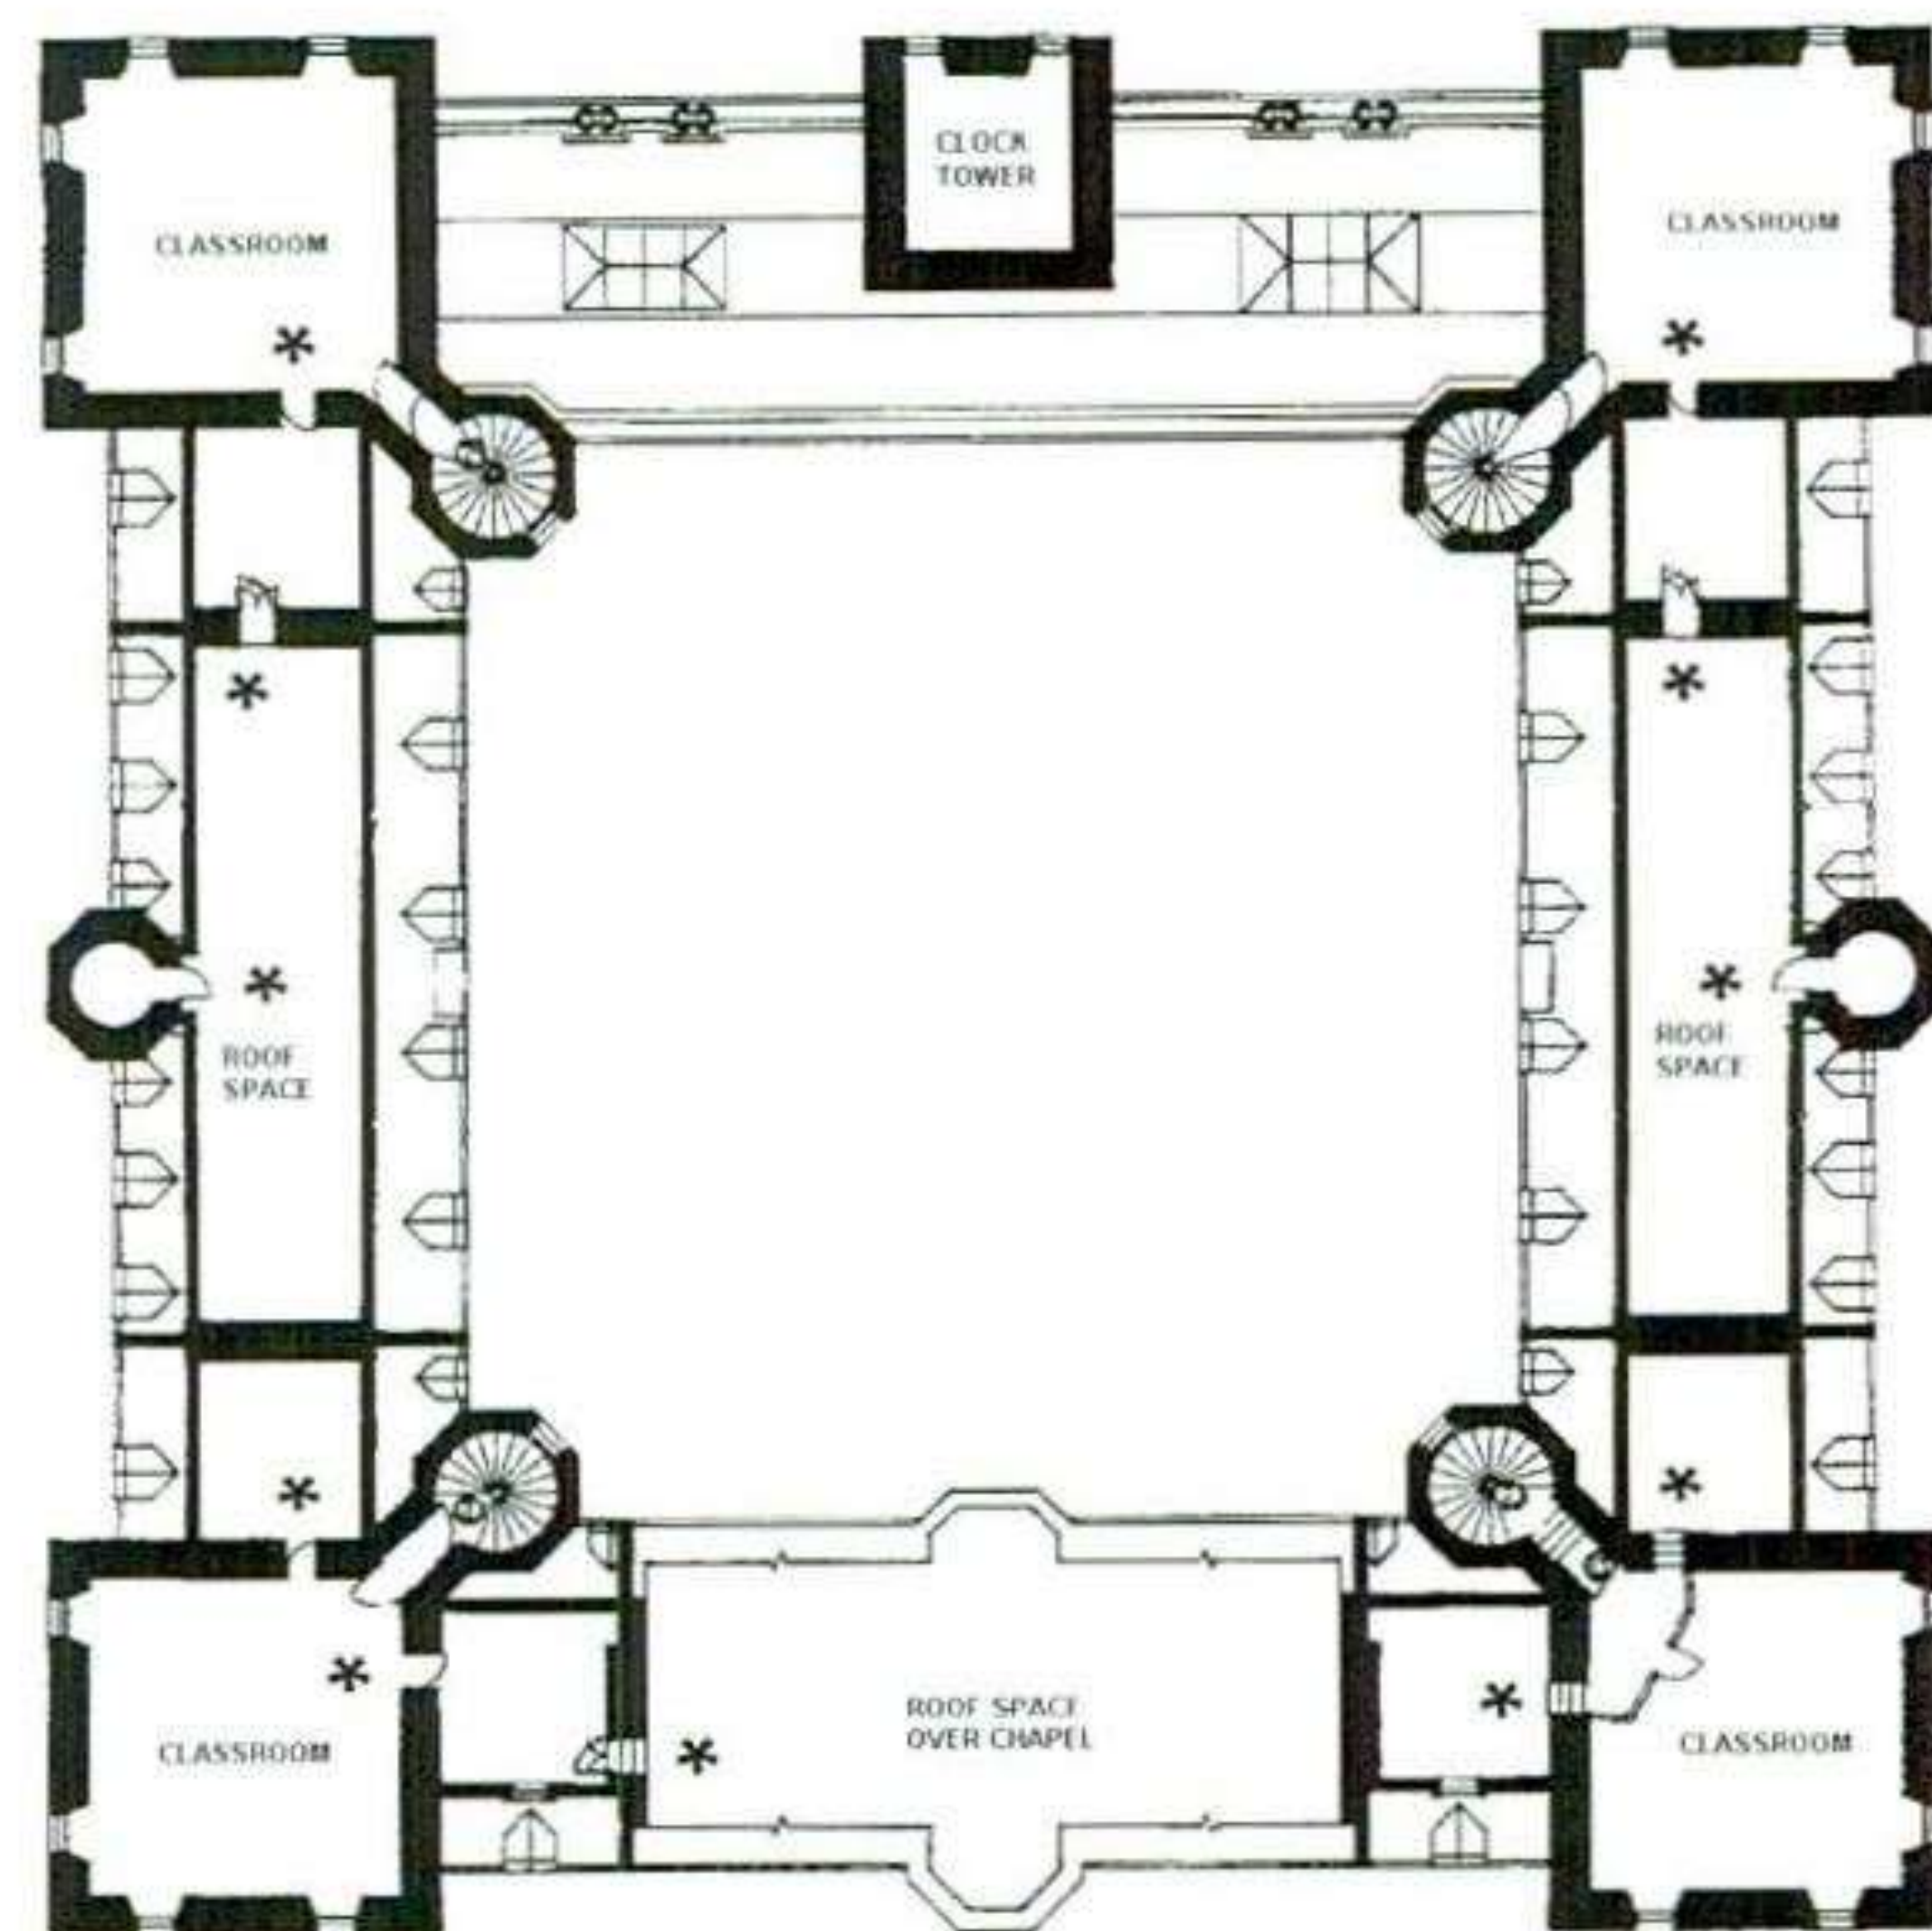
George Heriot's School, Edinburgh. Plan of third floor.
